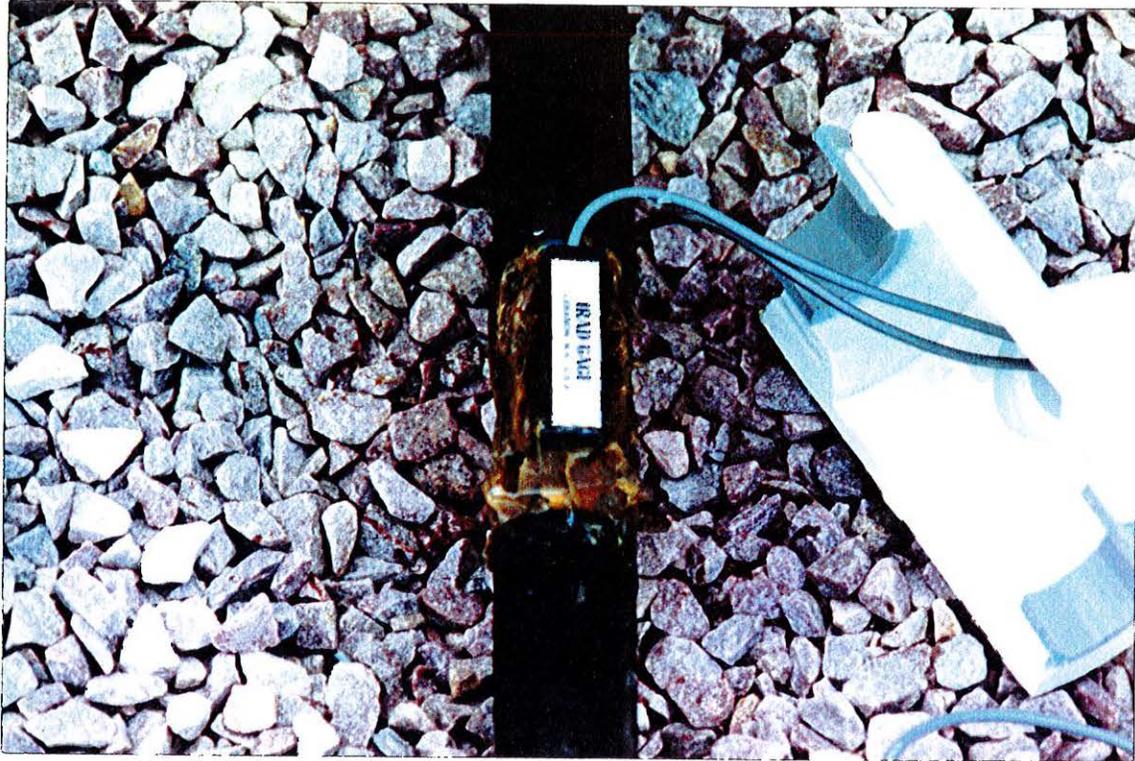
Gage Cover Installed and Corrosion Inhibitor Replaced
